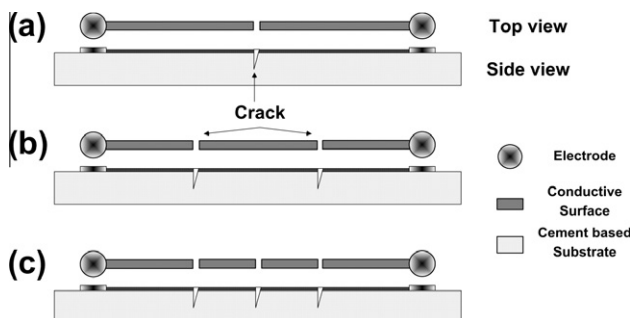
Schematic illustration of a cracked conductive surface on a cement based substrate: (a) single crack, (b) two cracks, and (c) multiple cracks.
